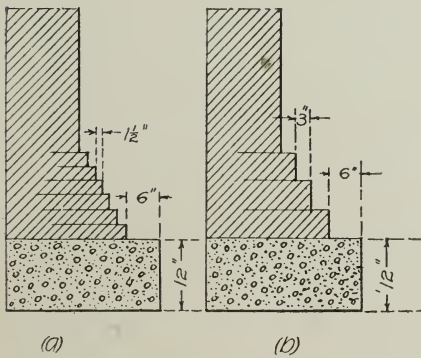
Offsets of Concrete and Brick Footings Under Outside Walls.
